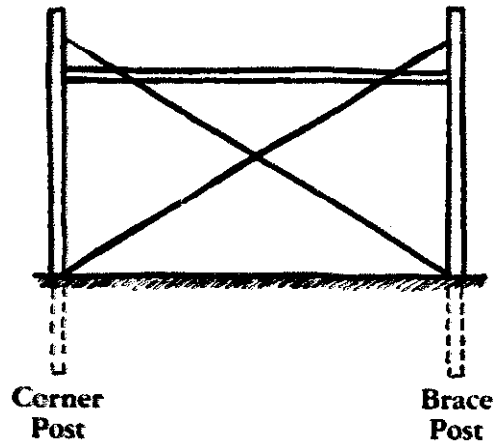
Bracing a corner post with a horizontal strut and with crossed ties.
